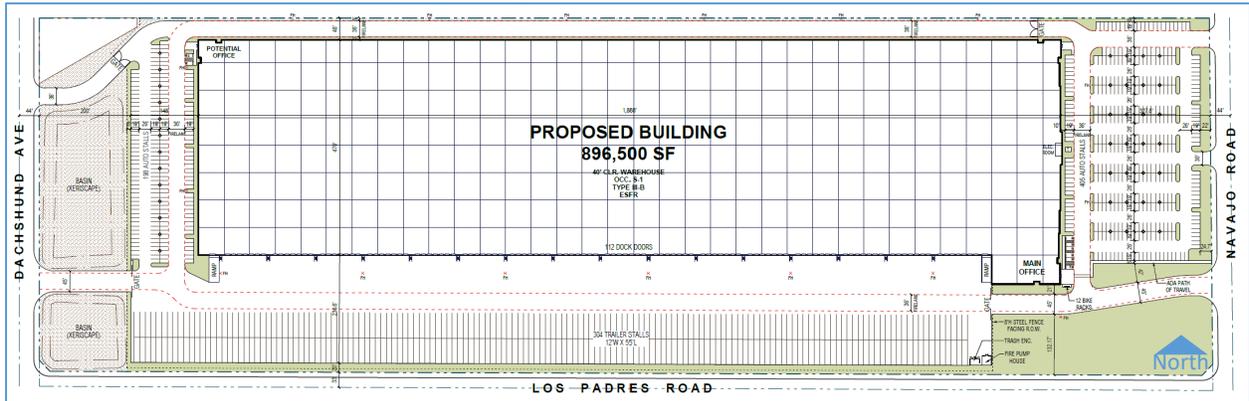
Project Site Plan - Watson High Desert Logistics – East Project Site
